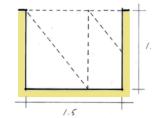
sketch shows the ratio between street width and the maximum building height. This is to ensure that the building heights are no higher than 2/3rd the width of the street.
